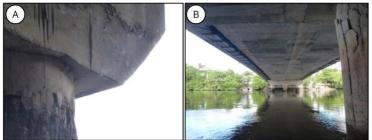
Reinforcement Corrosion. (A) Caisson reinforcement exposed and section loss due to corrosion; (B) Area with exposed reinforcement and concrete cracking due to corrosion
